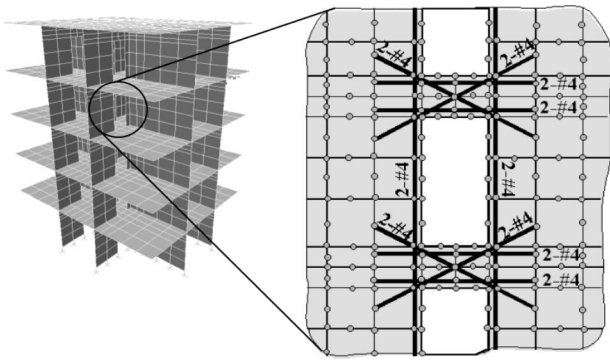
Three-dimensional finite element modeling of five-story building, and its edge and diagonal reinforcement detailing around openings
